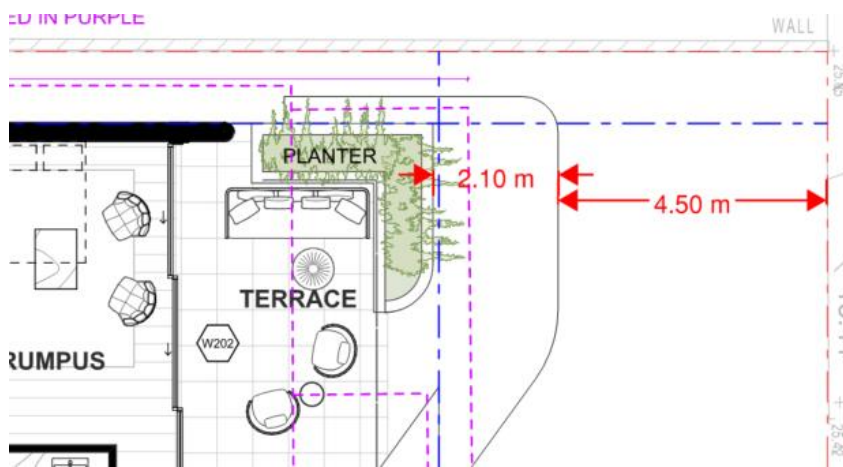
Proposed first floor plan with Council markings in red - 61 The Corso, Maroubra (Source: PopovBass)
